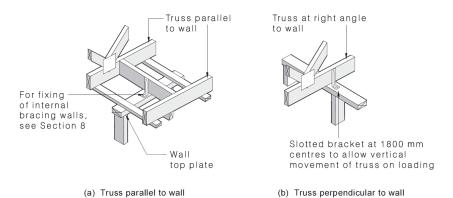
AS1684 Figure 6.11 shows a fixing detail between trusses and non-load bearing internal walls
